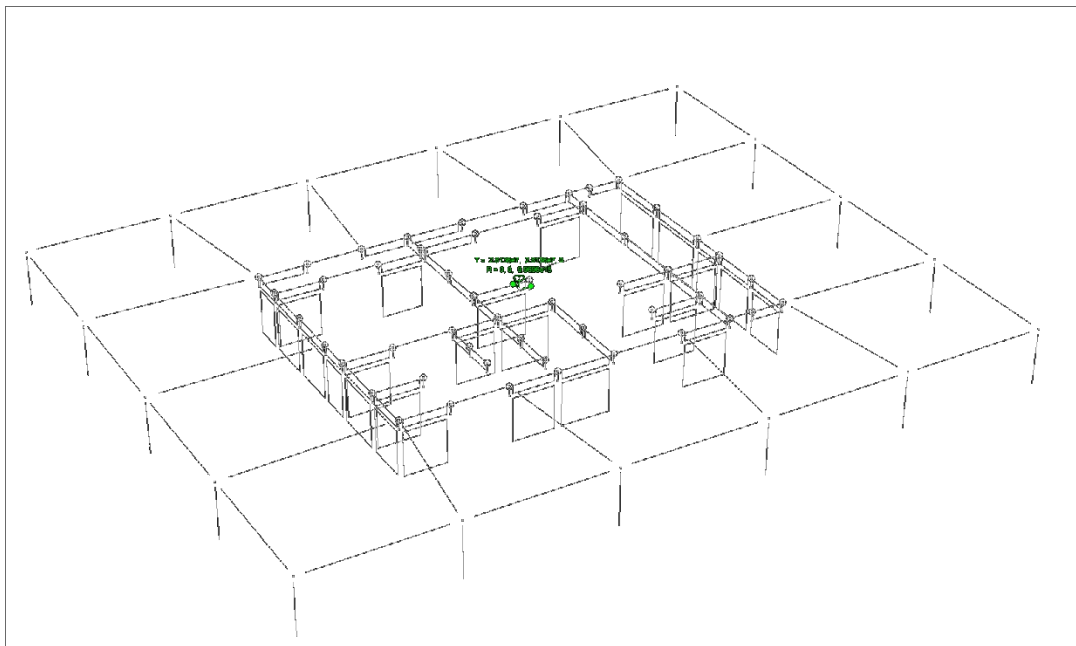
Typical Floor P3D Model Plan of the Case Study Tall Building
